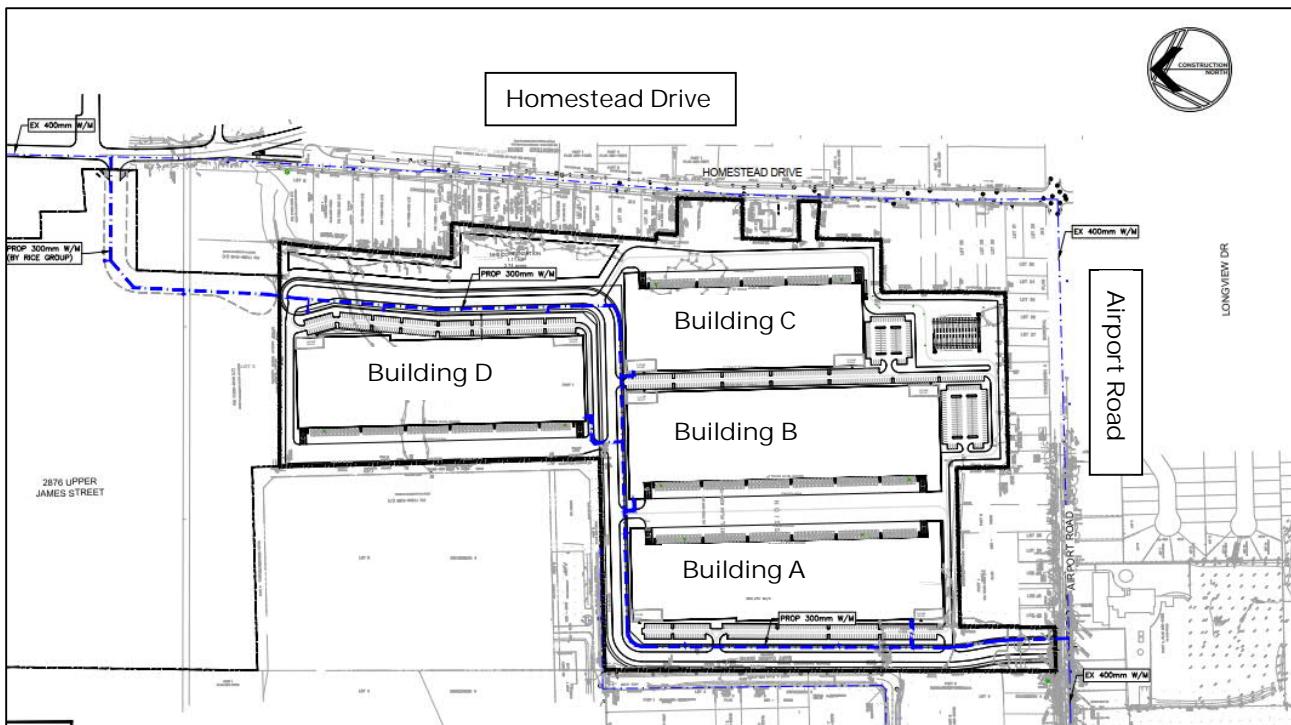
2: The Proposed 3054 Homestead Drive Development Site Plan (Option 2)
